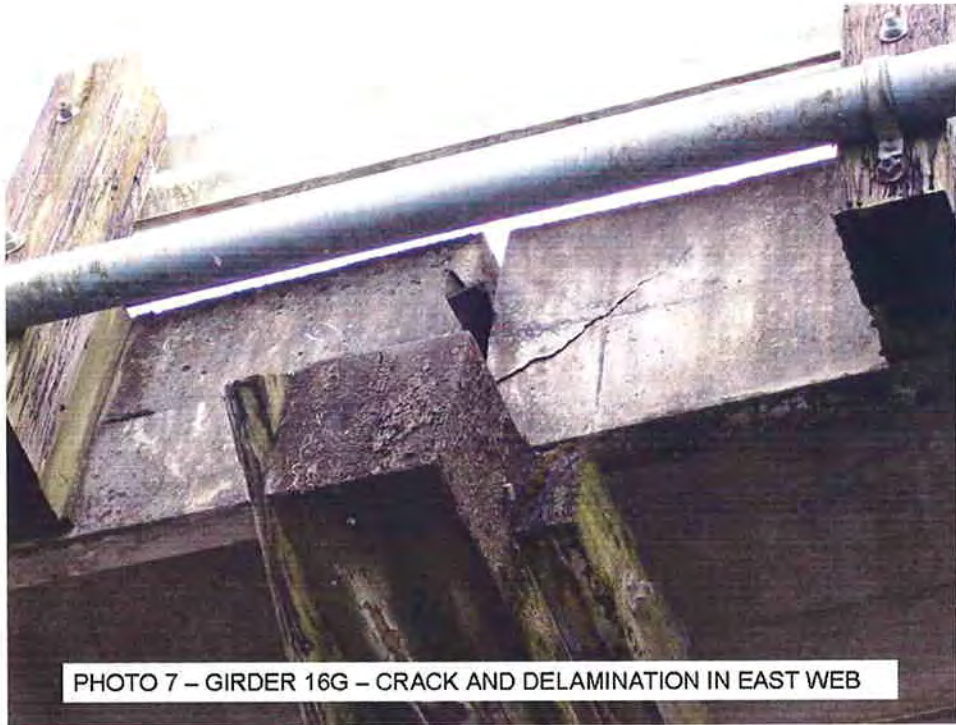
GIRDER 16G – CRACK AND DELAMINATION IN EAST WEB
